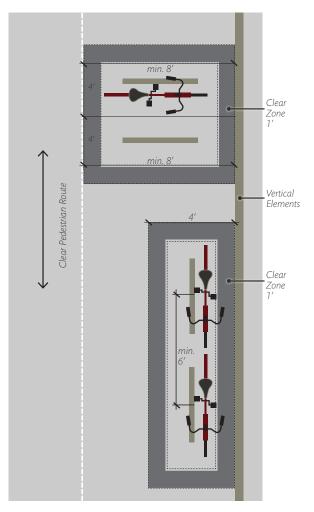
Bicycle Parking Stall Layout Options
